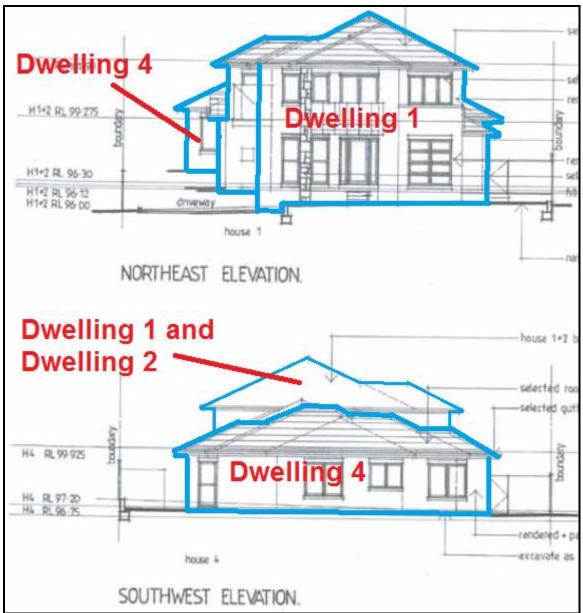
Extract of the North-east (front) and South-west (rear) Elevation drawings of the proposed development with the visible dwellings in the development highlighted in blue and labelled in red. Noted in this diagram is the two (2) storey presentation to Blaxland Road and the single storey presentation to the rear boundary with the two (2) storey height of Dwelling 2 visible when viewing the development from the rear.
